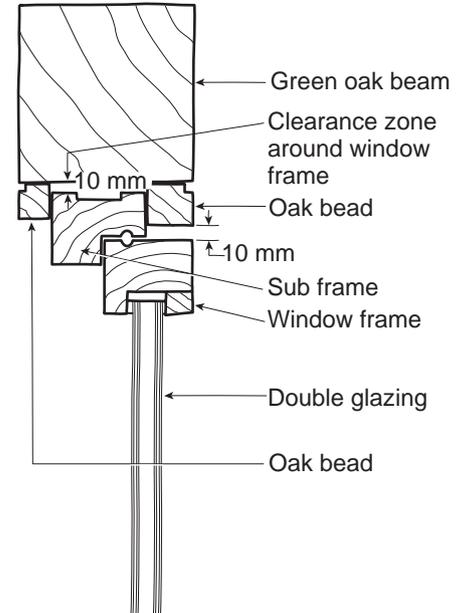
Detail at clerestory window head. All joinery and fittings made from seasoned oak
